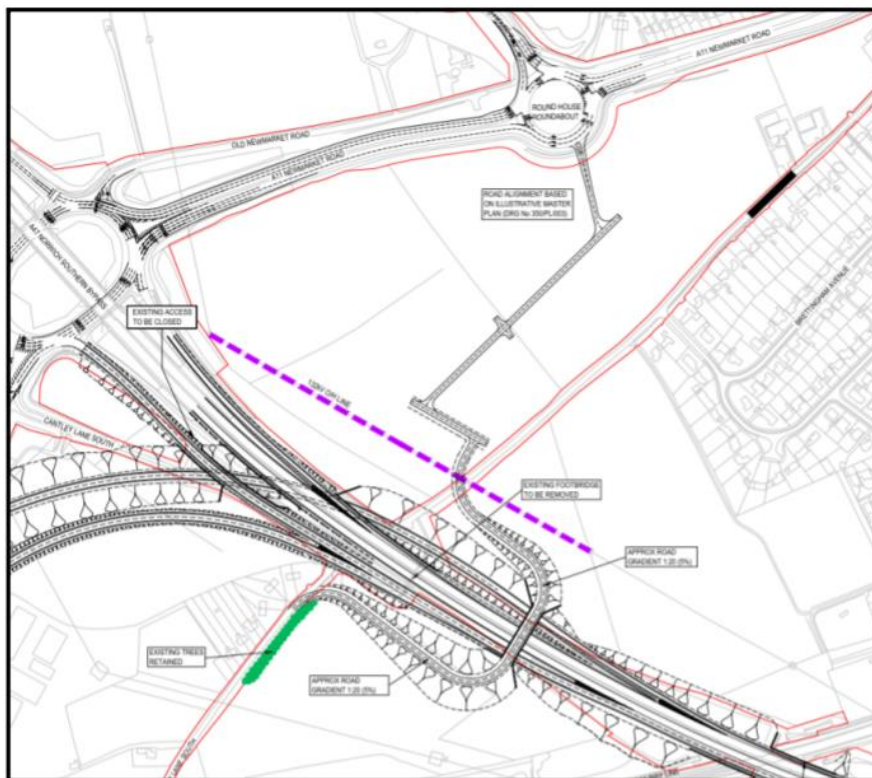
Option 1: Connection of Cantley Lane South to Round House Roundabout via an overbridge across the A47
